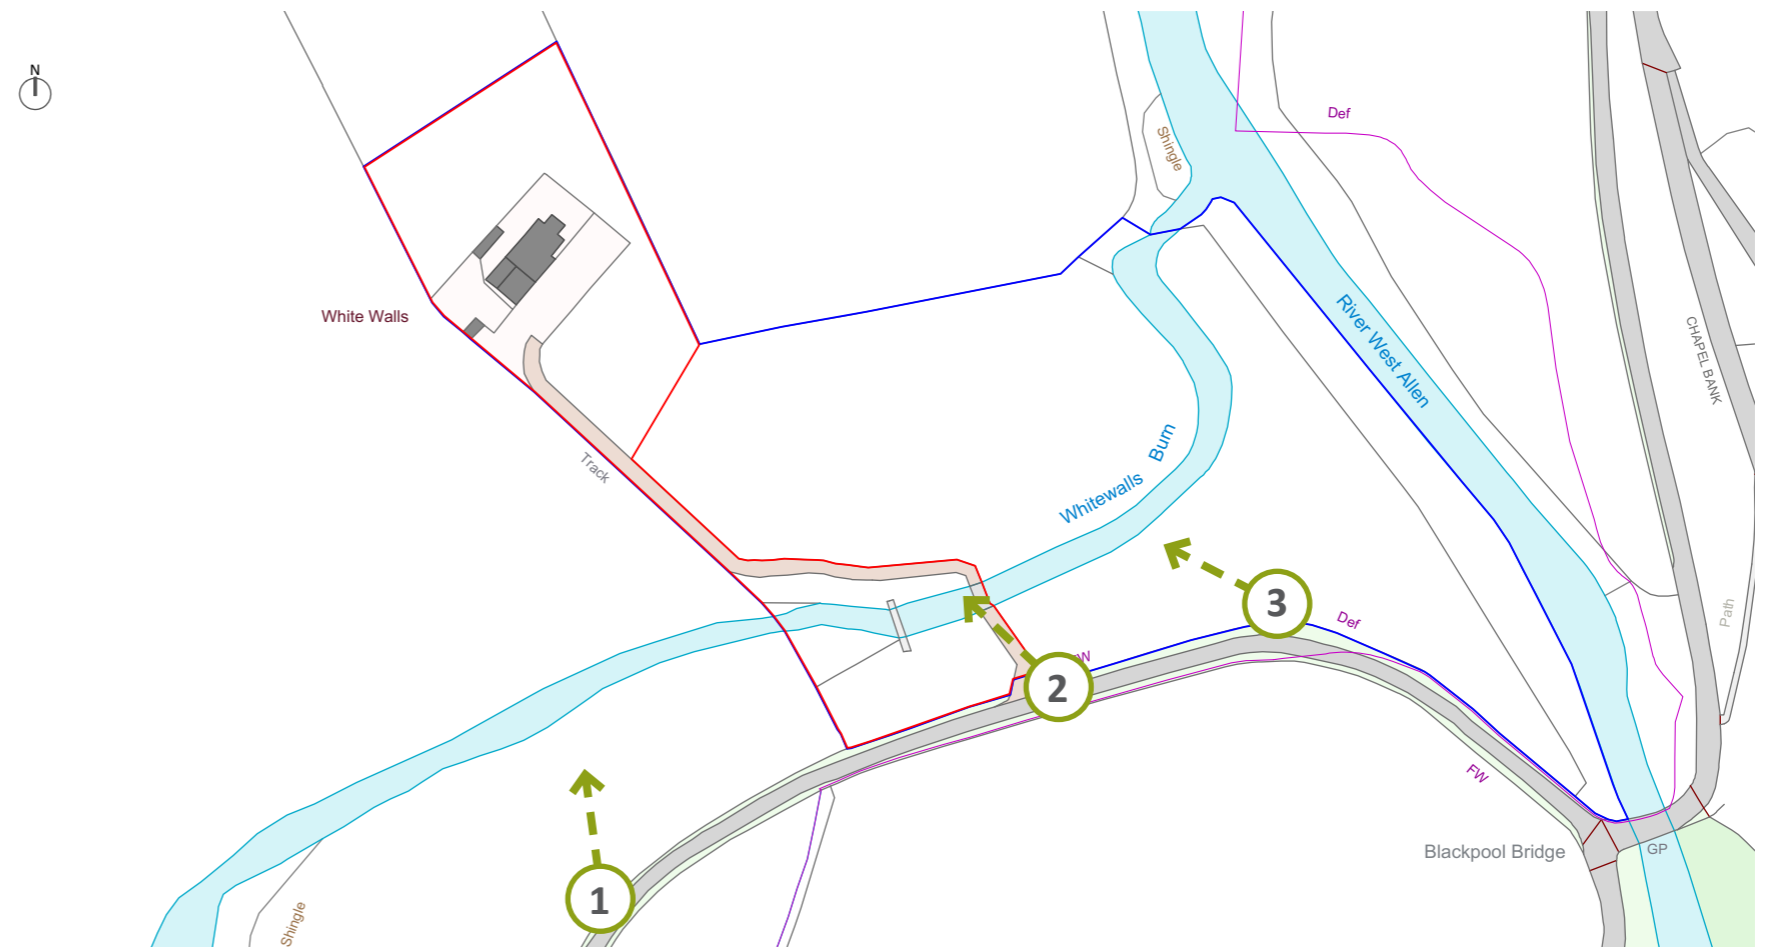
Existing Site Plan Highlighting Key Views from Main Access Road
